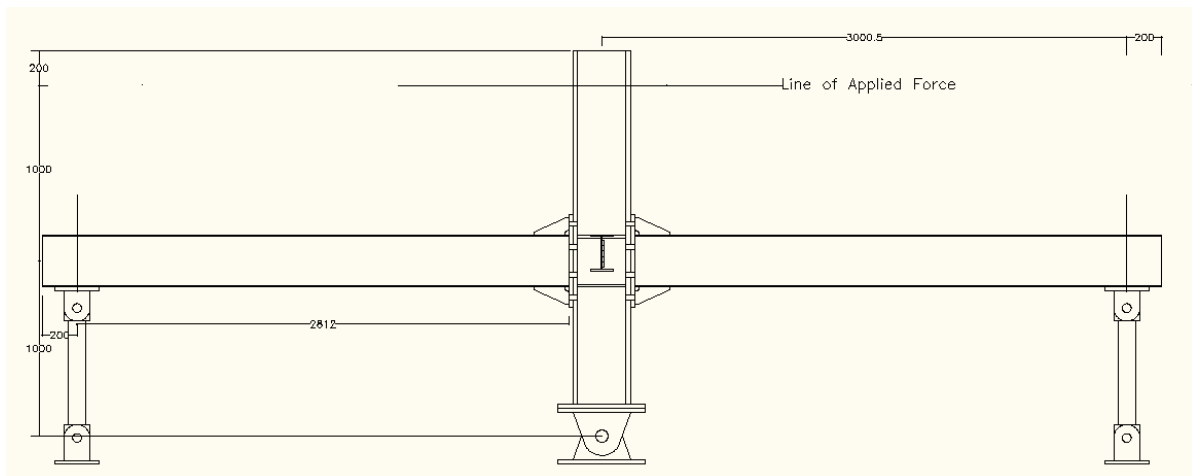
Steel subassembly elevation for subassemblies 1, 2, 3 and 5.
